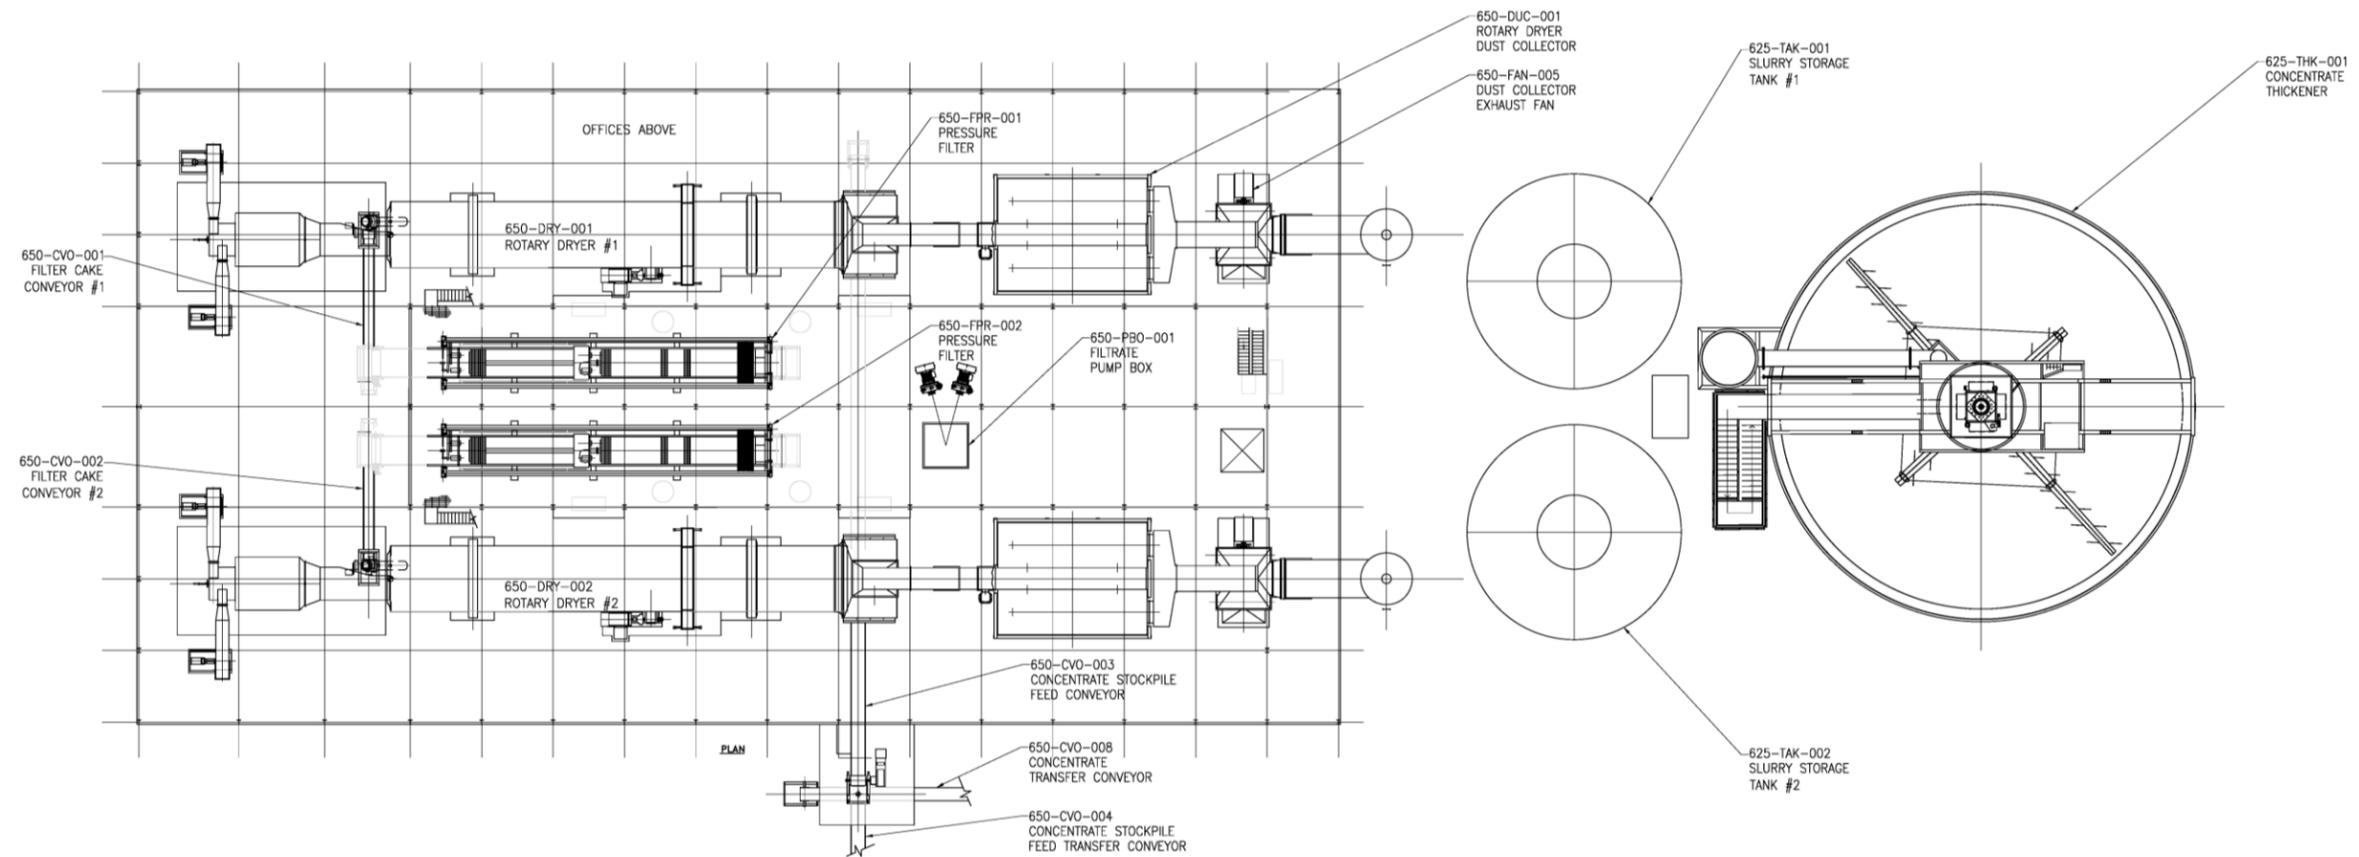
Sioux Lookout Filtering and Drying Facilities General Arrangement Plan View
